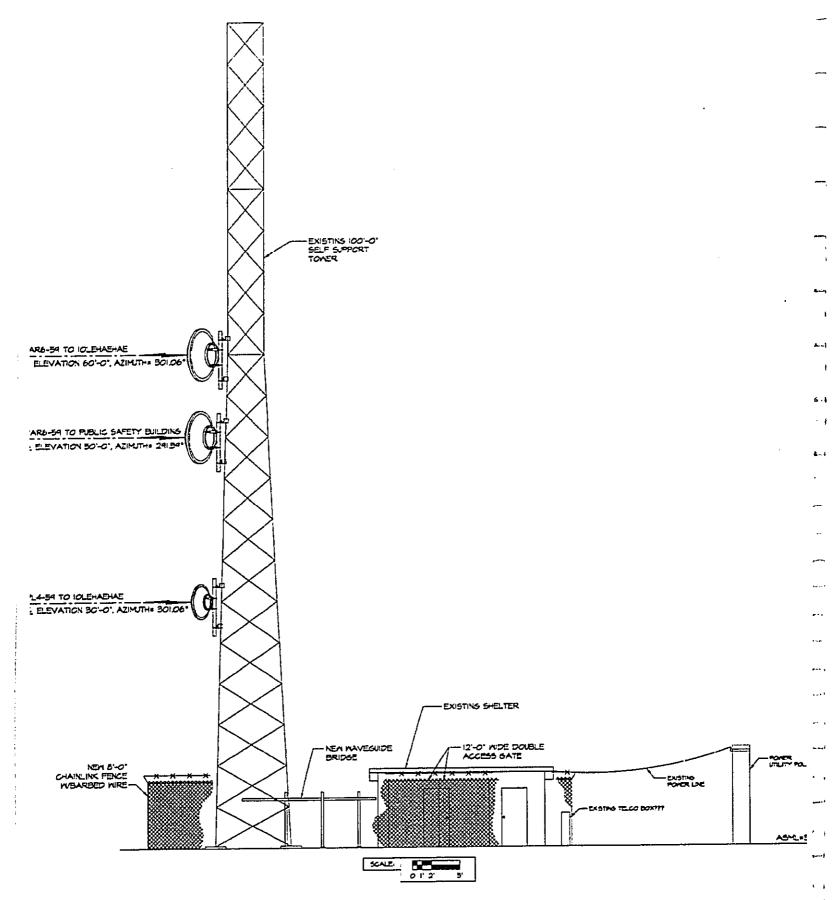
E Hilo Baseyard / Elevation Plan (looking north)
